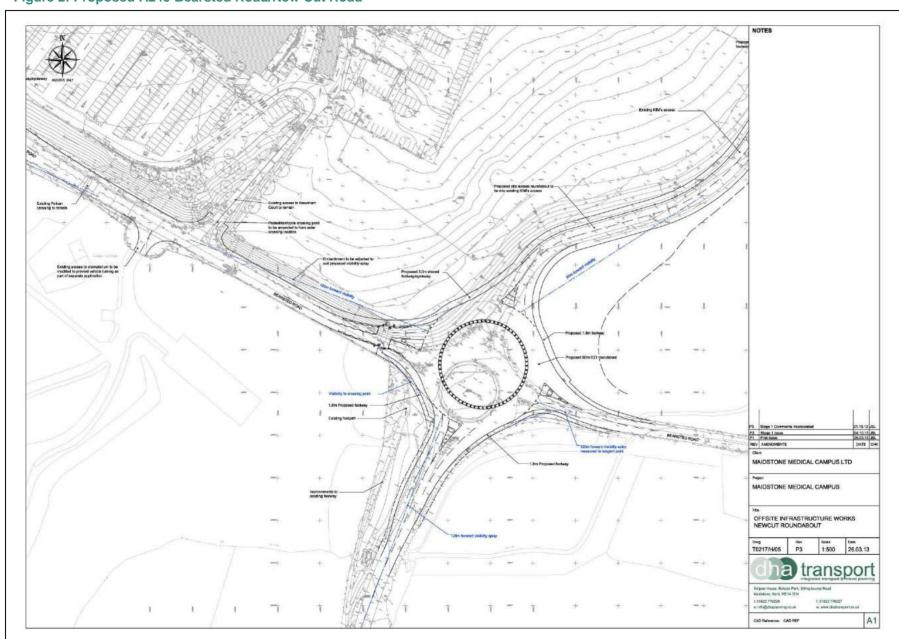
Proposed A249 Bearsted Road/New Cut Road
